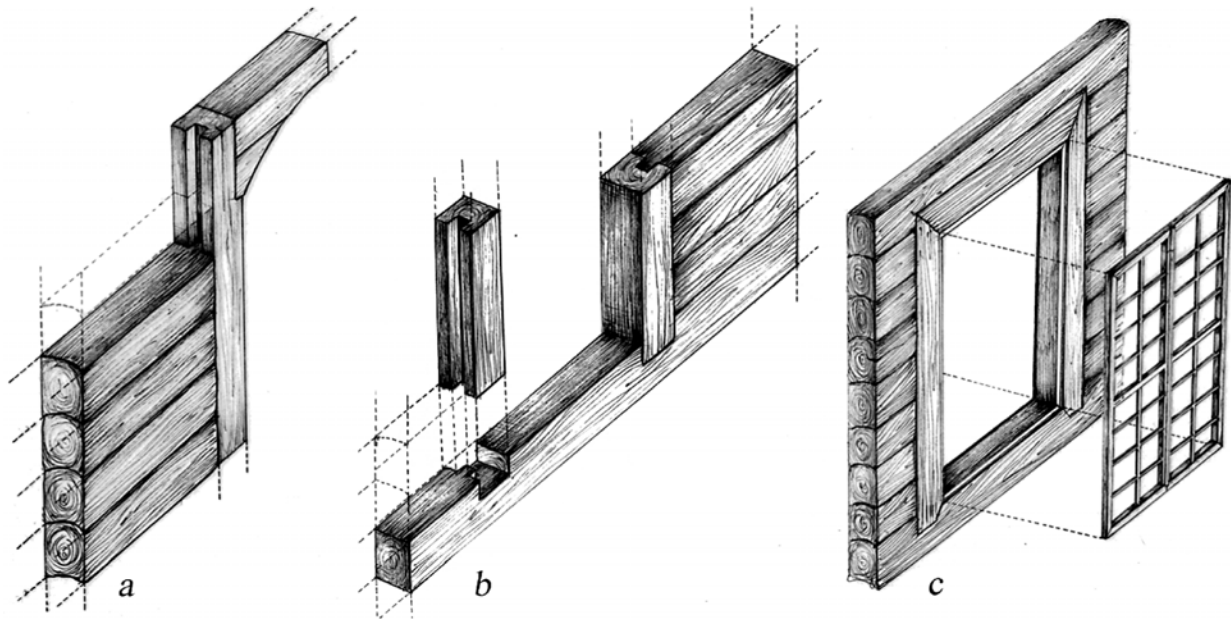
Opening construction system (designed by L. Berežanskyté)
